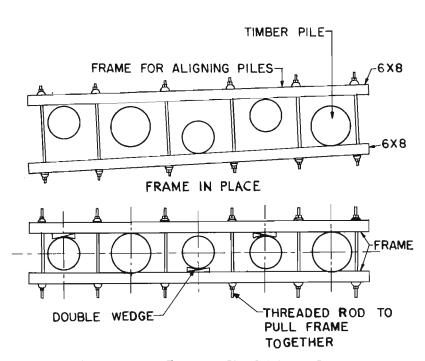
Aligning timber piles and successive steps in completing pile bents.
